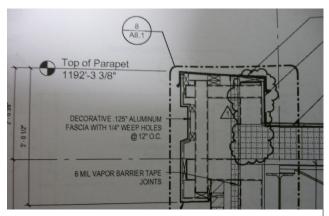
Is the detail drawing of the connection between the aluminum fascia and the structure of the building.
